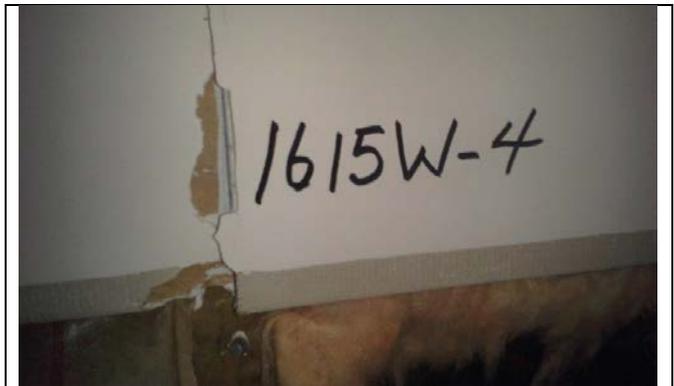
Drywall/JC (1615W-4) Bedroom 1, Wall C.
